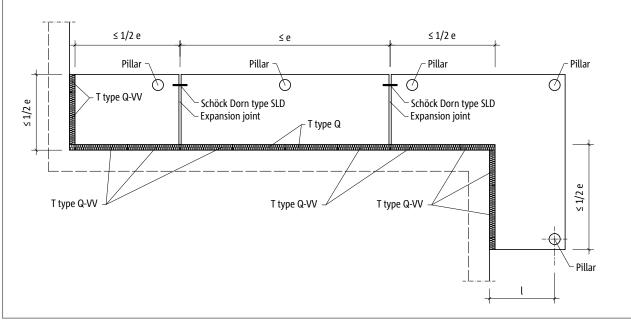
Schöck Isokorb® T type Q, Q-VV: Expansion joint layout
